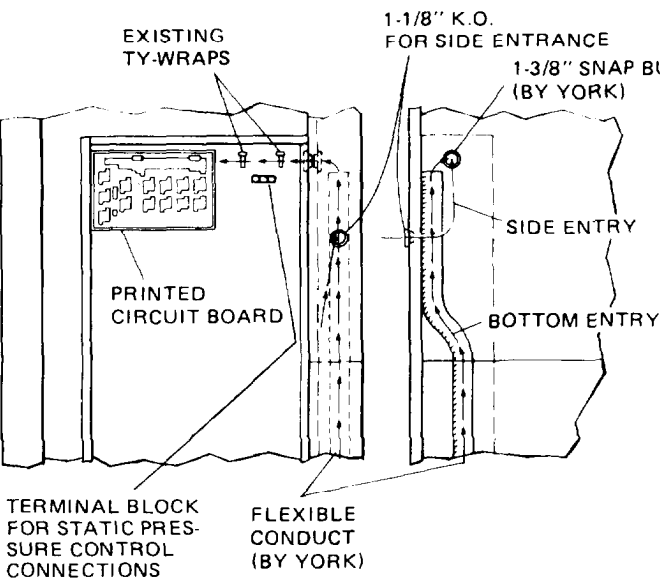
CONTROL WIRING ENTRANCE (DSV300, 360)
